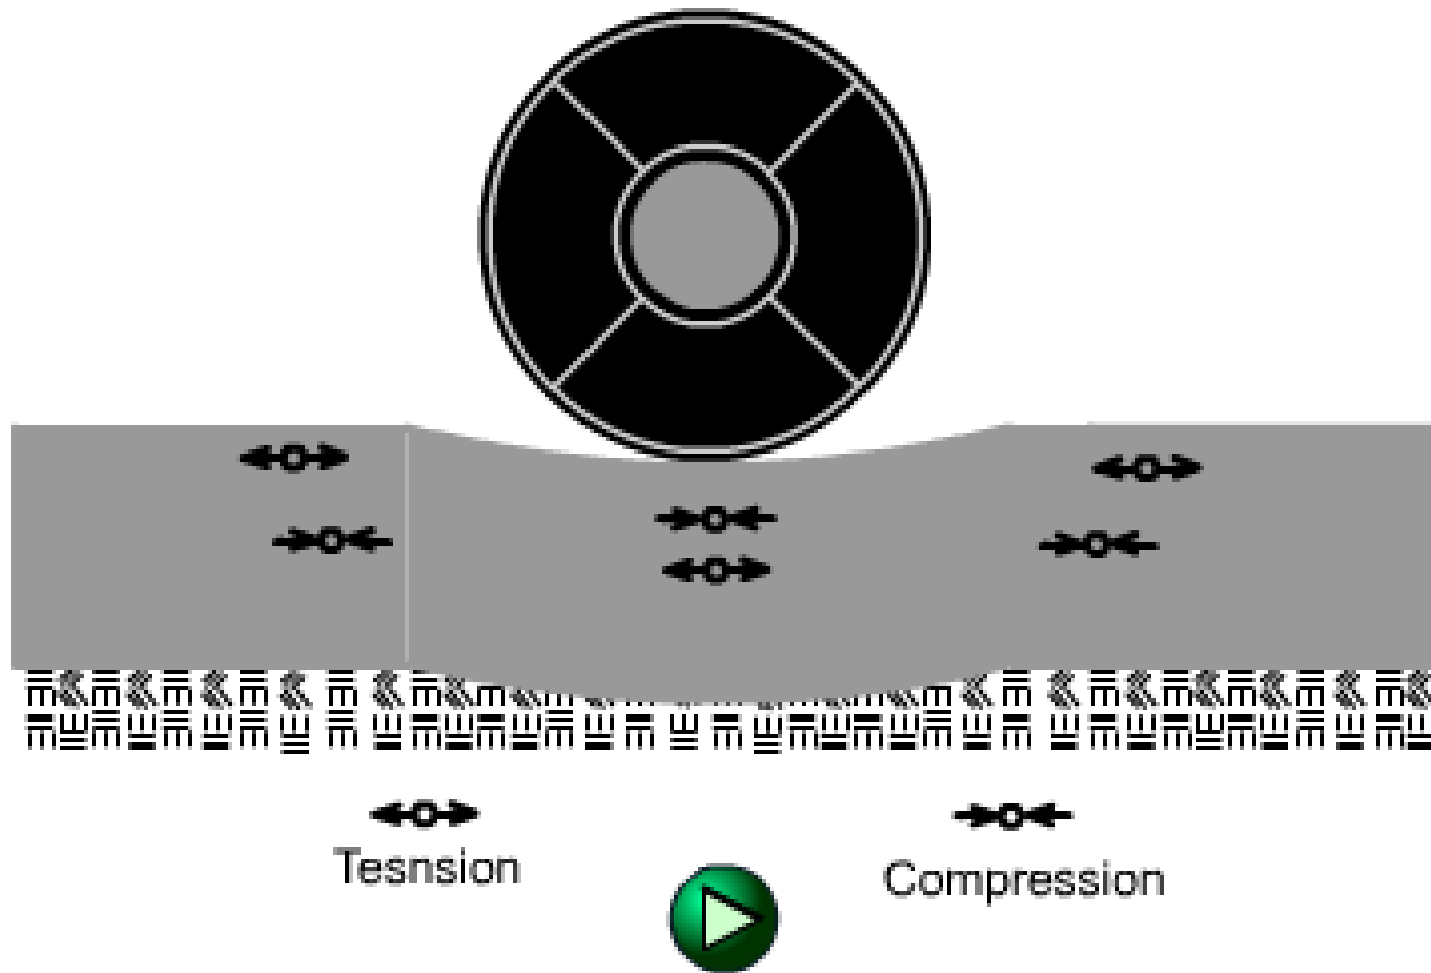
Schematic of Tensile and Compressive Stress in Pavement Structure
